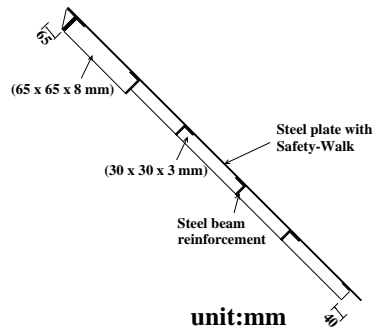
NCTU model retaining wall with inclined interface plate
